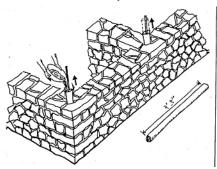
C: Seismic Strengthening: Installation of Vertical Bars at Wall Corners
